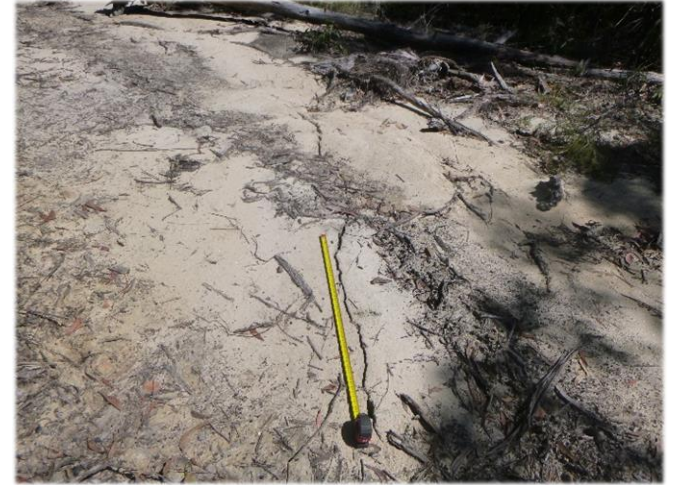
DA3B_LW16_034*, looking at the length of soil cracking on access track parallel to *WC15*. Taken on 28/09/2020.
